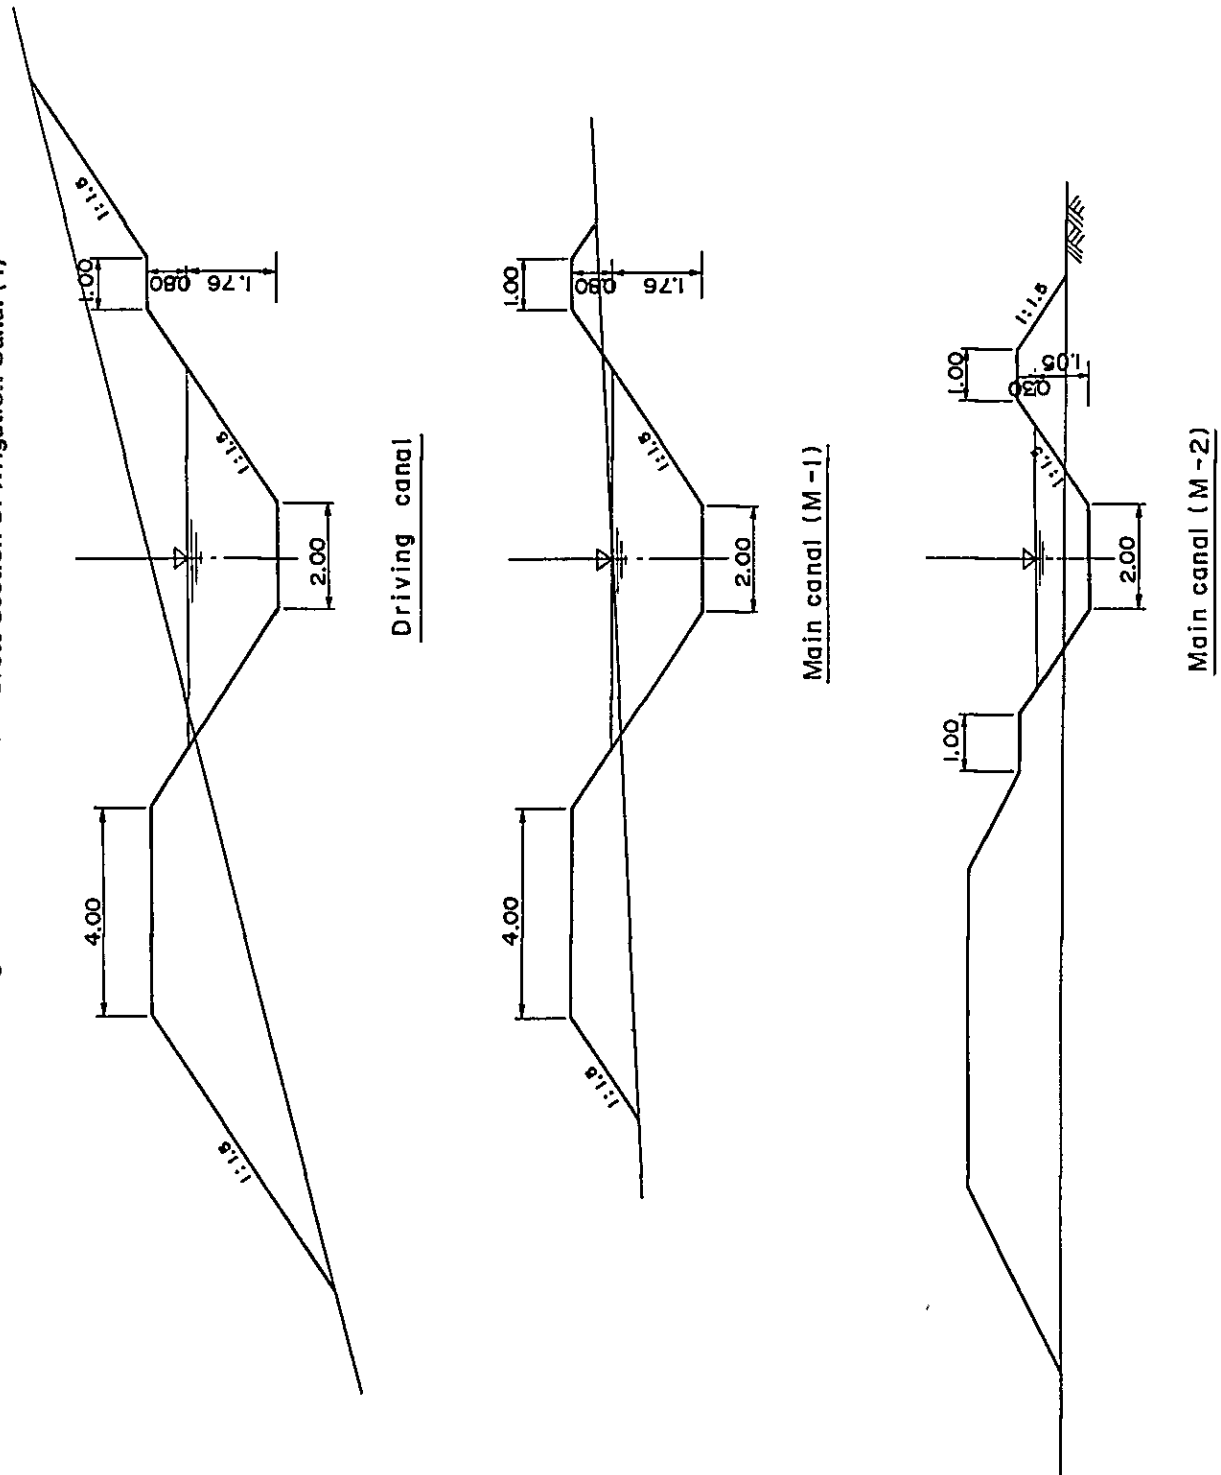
Standard Cross Section of Irrigation Canal (2)
